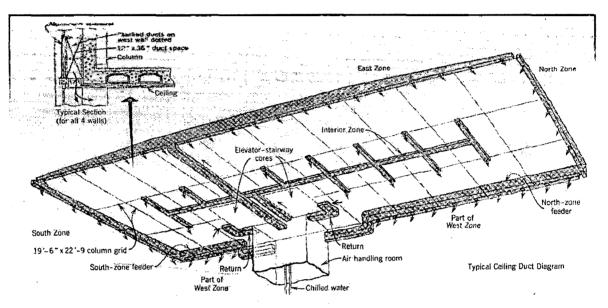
Reflected ceiling plan for Luz Electricia Building Source: McGuinnes W.J., Mechanical and Electrical Equipment for Building
